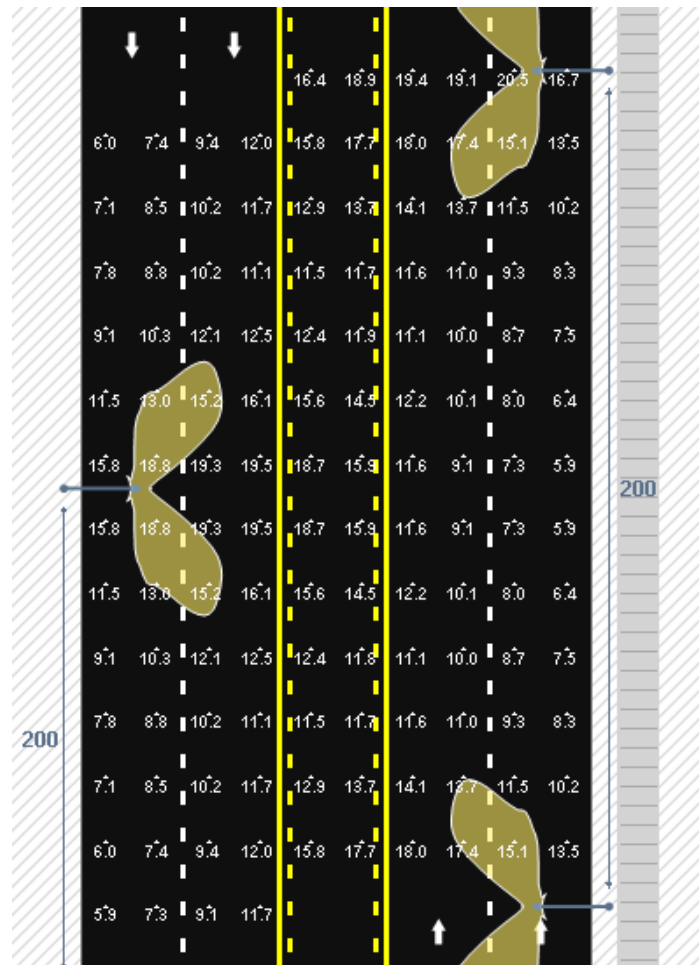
Example lighting calculation for the Central Avenue section, with poles spaced 200 ft apart.
